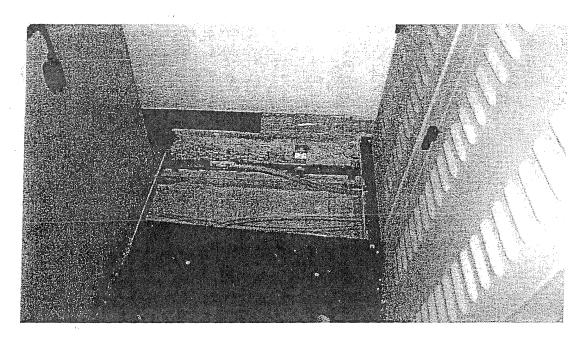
Sub Junction Level, Room SJ1, West Wall. Inspection of the gypsum board walls below the raised access floor in the Equipment Room SJ1 revealed heavy concentrations of black mold as shown above. It can be attributed to the water from the humidifier and plugged floor drain in the southwest corner of this room.
